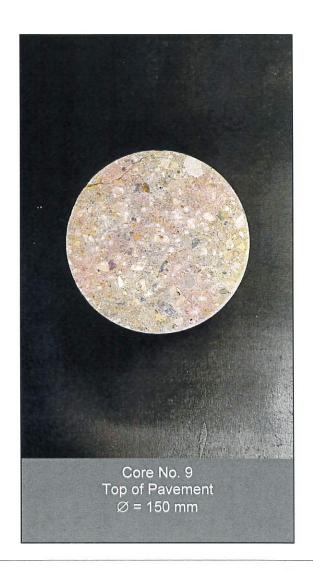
Specimen from West Fernwood Avenue, Eastbound Lane
